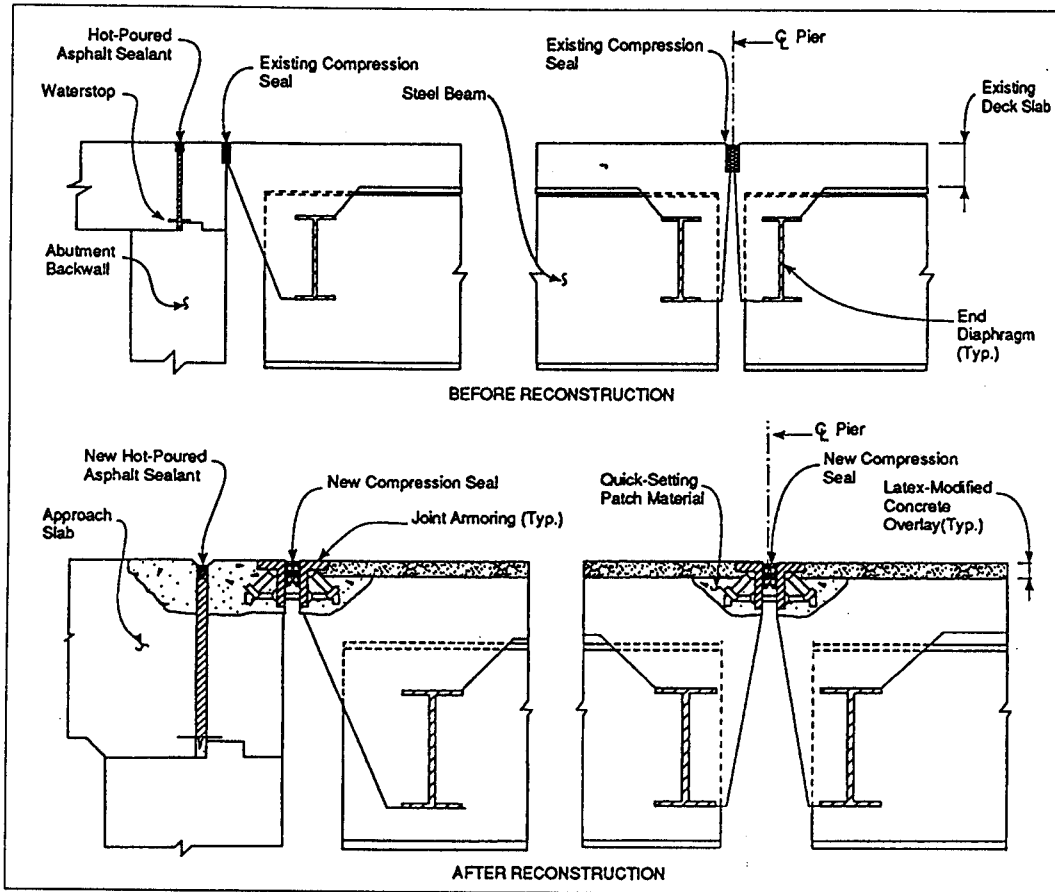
Replacement of compression seals in kind on Cherry Hill and Littleton Road bridge
